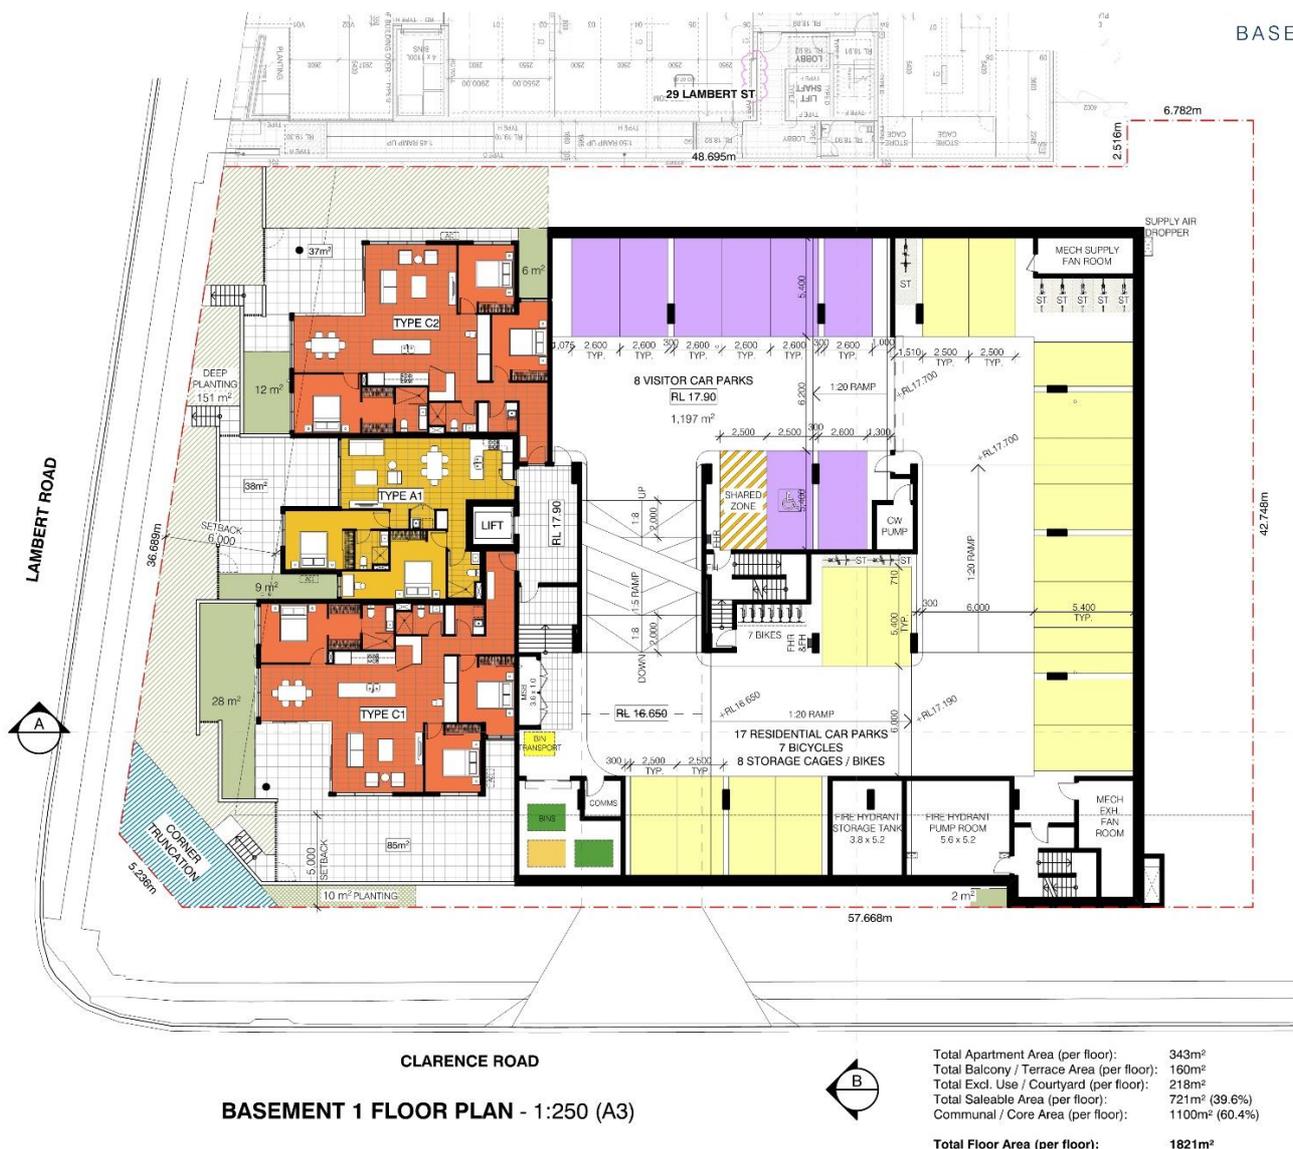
The proposed Basement 1 Floor Plan with the boundaries of the amalgamated landholding that comprises the subject site shown with dotted linework. Note that the three dwelling units proposed on this level address the Lambert Road site frontage and are substantially removed from the adjoining heritage site. (Source: bda Architects)
